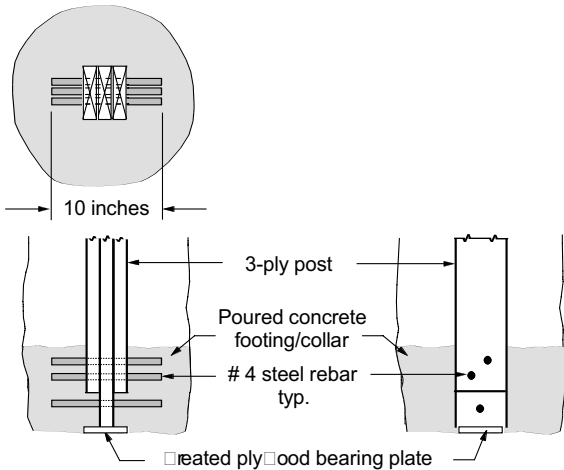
Post foundation with poured-in-place concrete footing/collar. Post supported by center ply until footing/collar is poured. Downward load transferred from post to footing/collar by steel rebars and by direct bearing of outer post plies.
